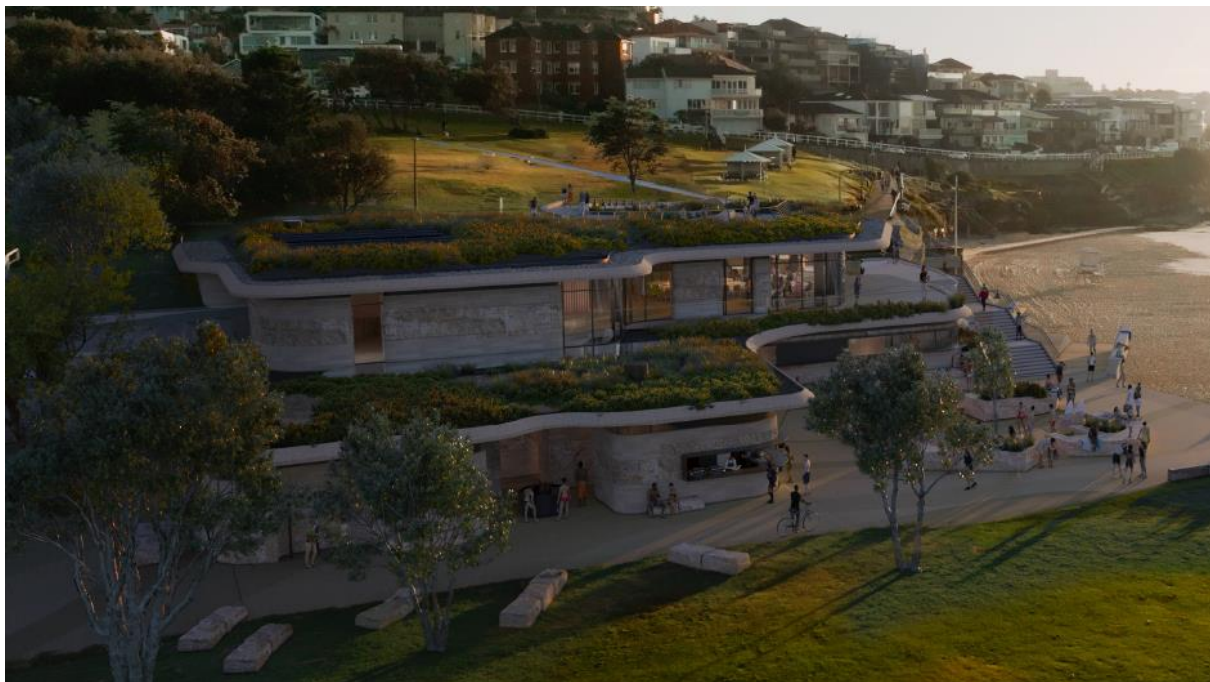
Proposed building as viewed from the south (Design Report 25.10.23)
